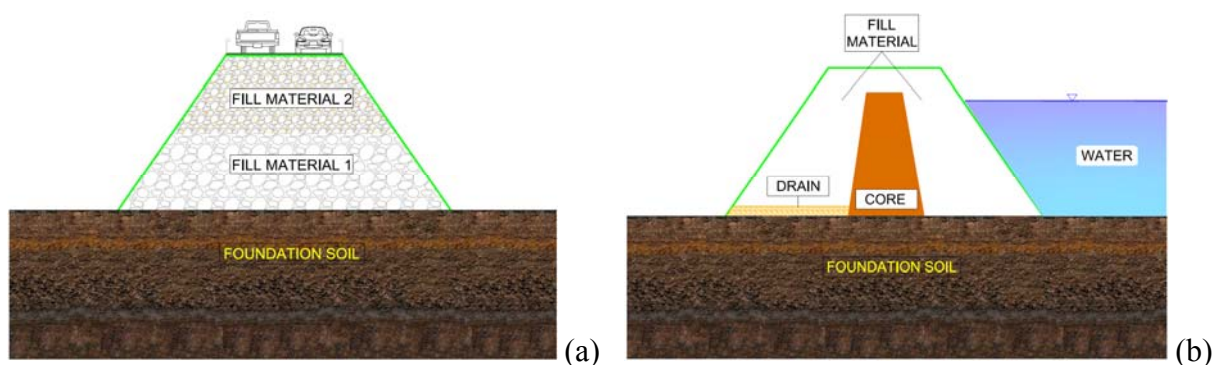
Typical cross section of embankment constructed for transportation purpose (a) and of embankment constructed for water management purpose (b)
